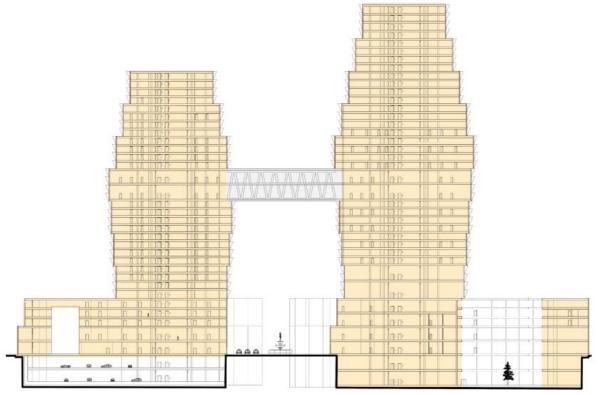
Side view plinth, including parking garage (Designed by the authors)
